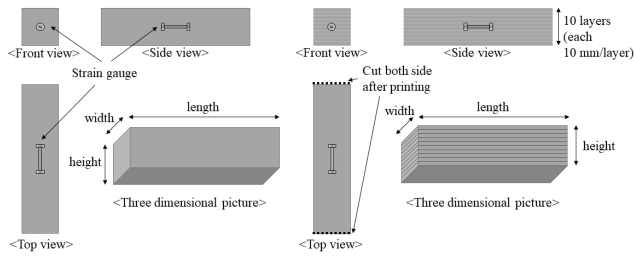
Specimens for shrinkage measurement (mold casted specimen - left, printed specimen - right)(Lee et al., 2019a)
